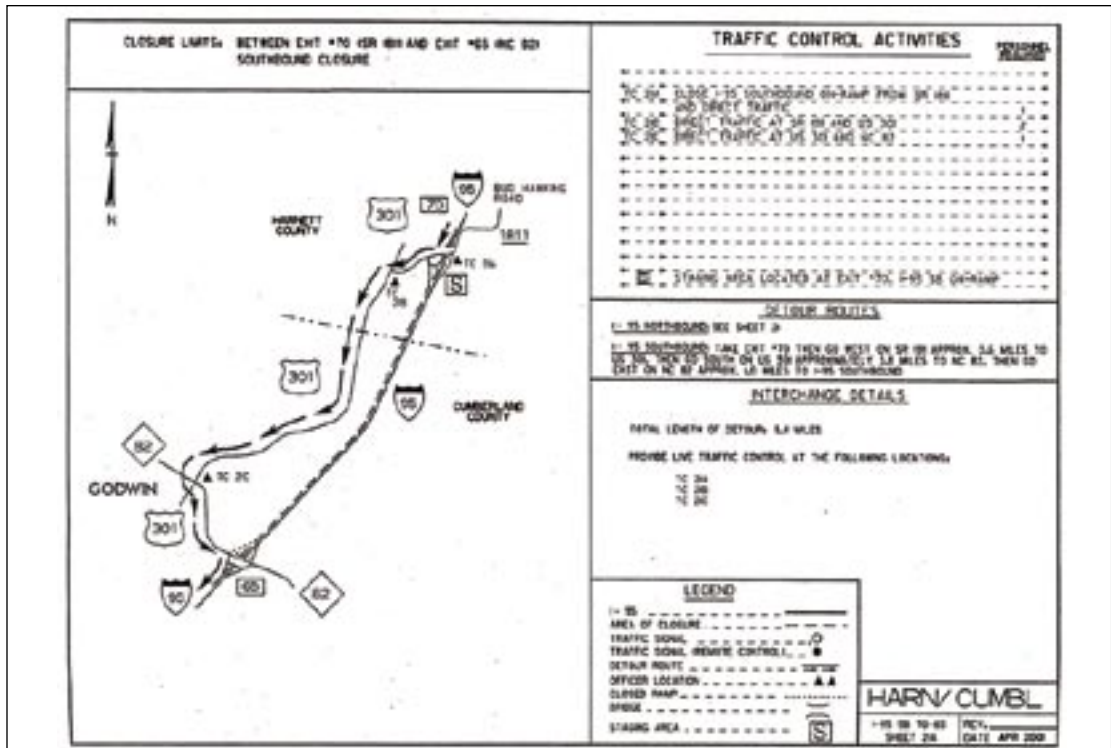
Detailed alternate route plan in rural area. (Source: North Carolina DOT)
